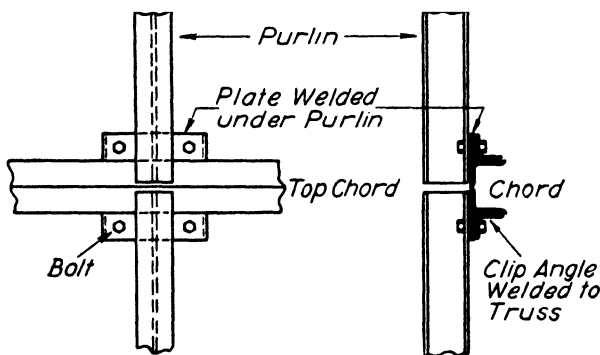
PURLIN CONNECTION FOR THE TRUSS OF FIG. 160.
